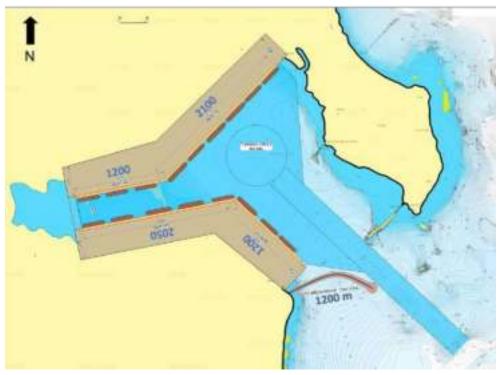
Campbell Bay Location – Proposed Layout (Site 5)
